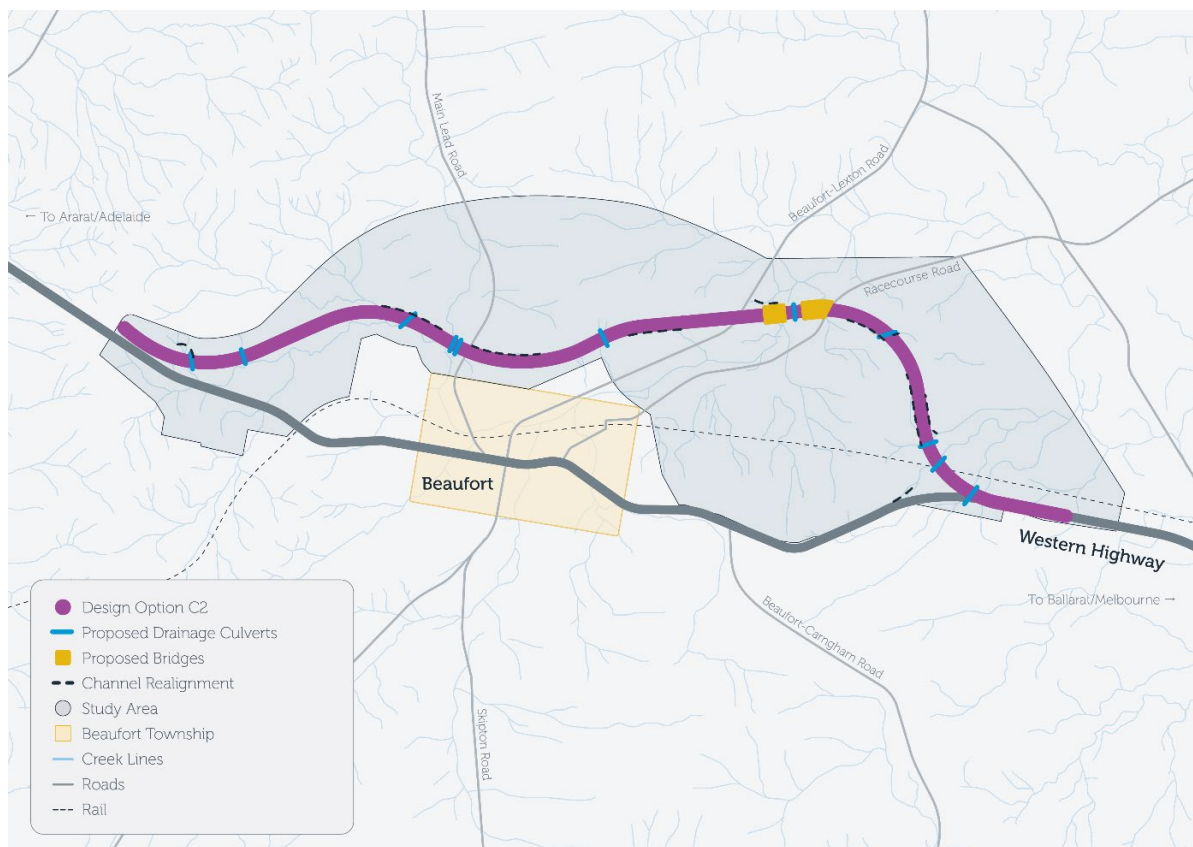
Proposed culverts, bridge, and channel realignments layout
